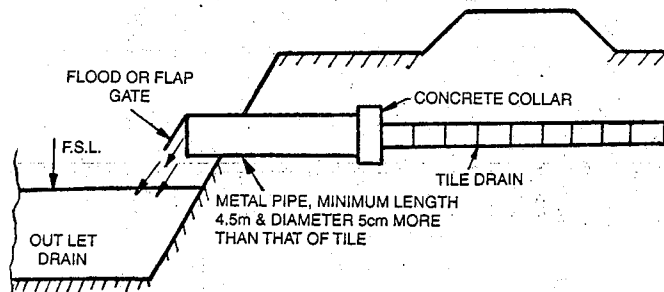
Gravity outlet (outfall) for tile drain.
